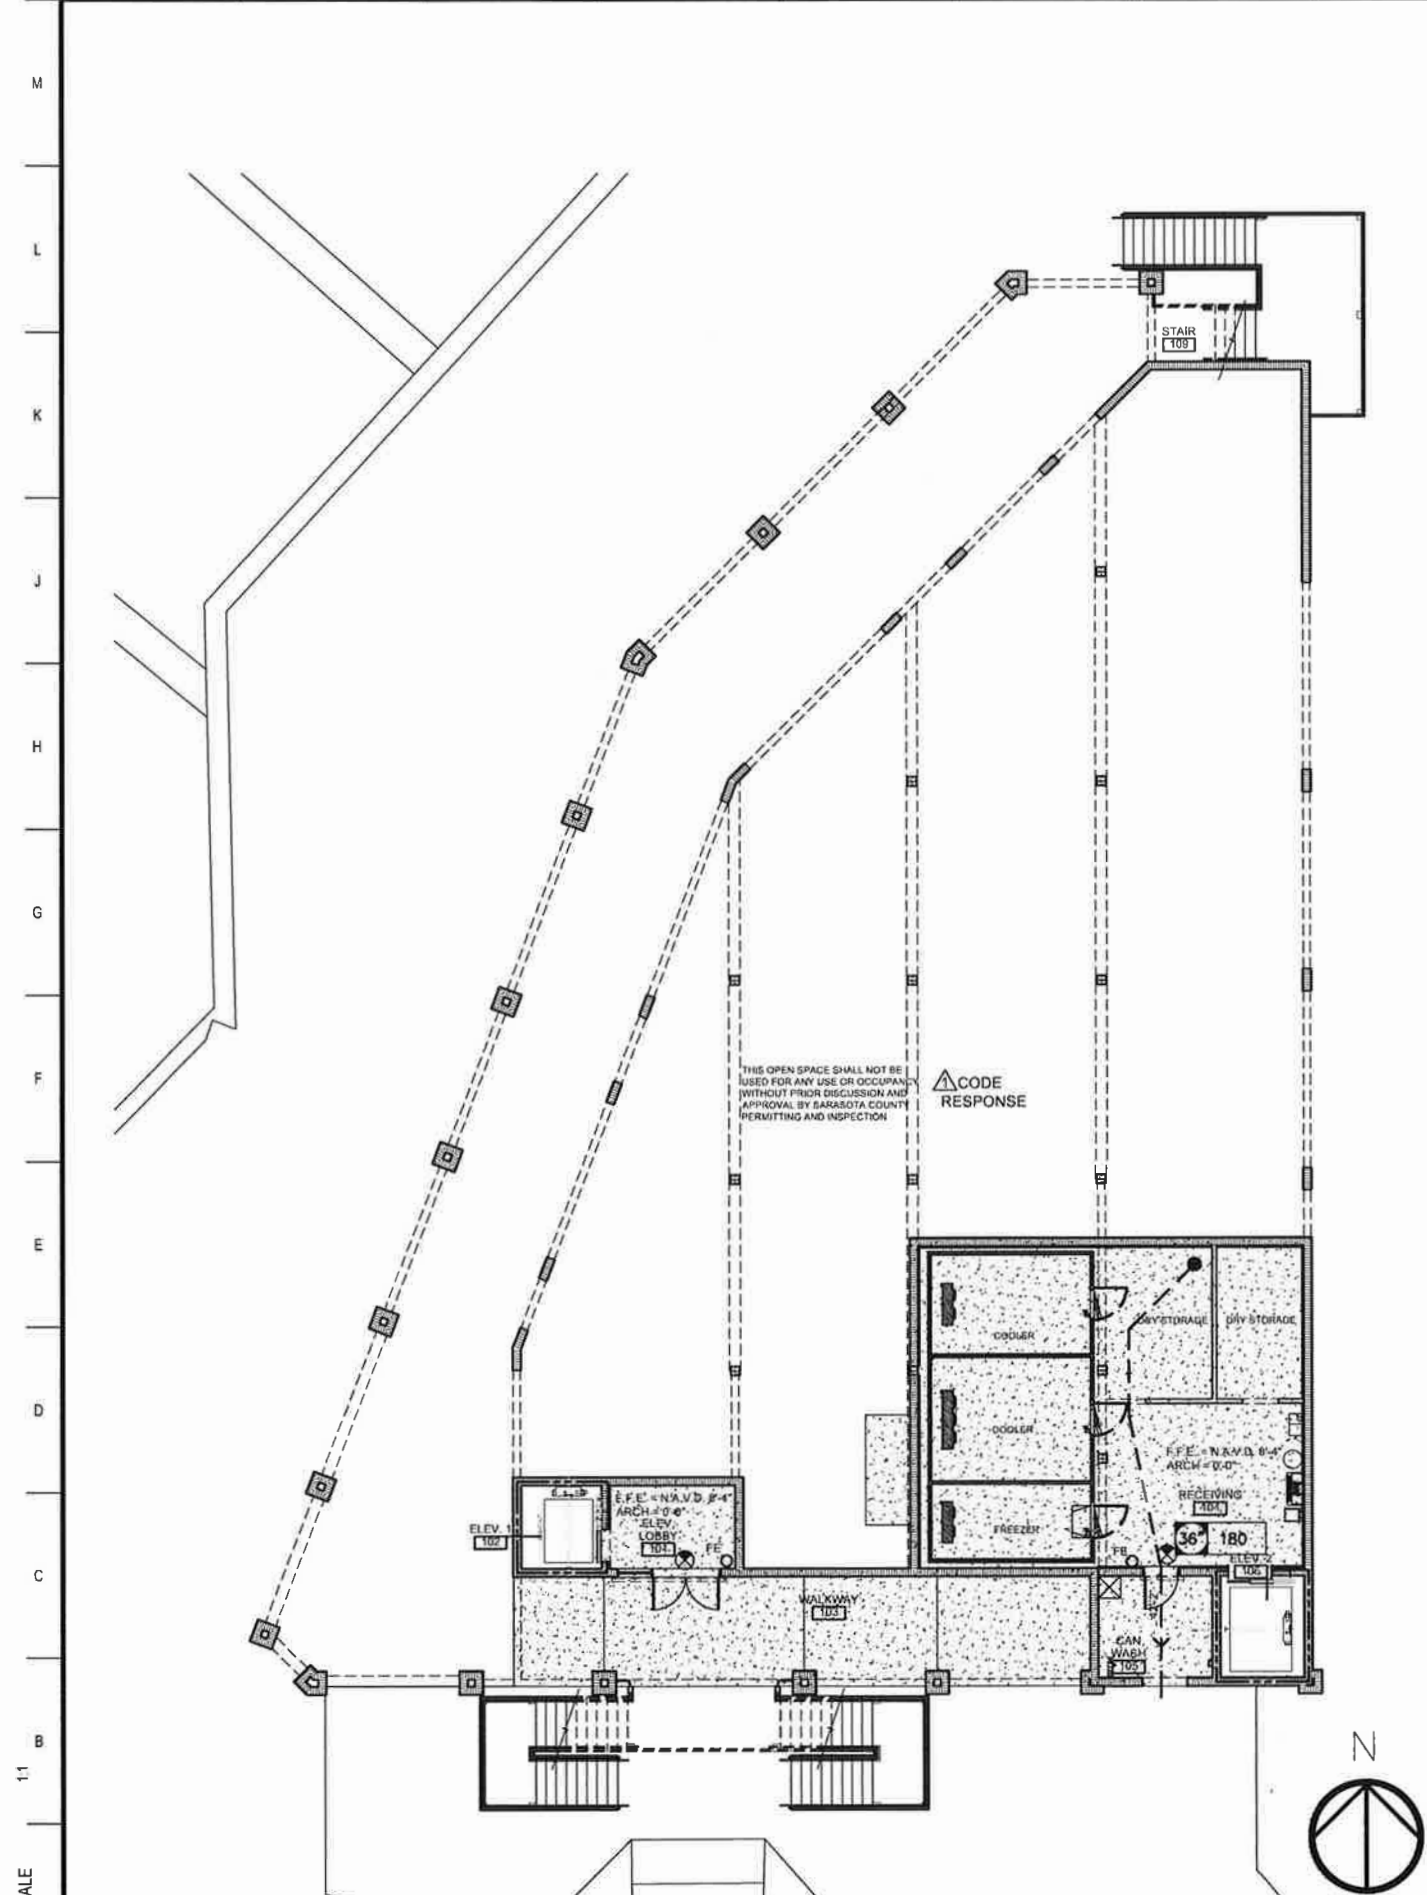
Exhibit B: Site Specific Floor Plan & Life Safety Plan
